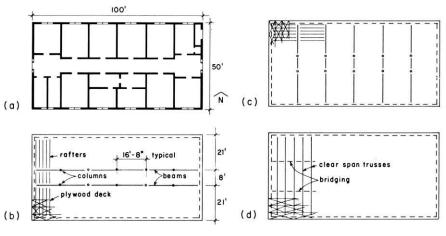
Developed plan for interior partitioning and alternatives for the roof framing.
